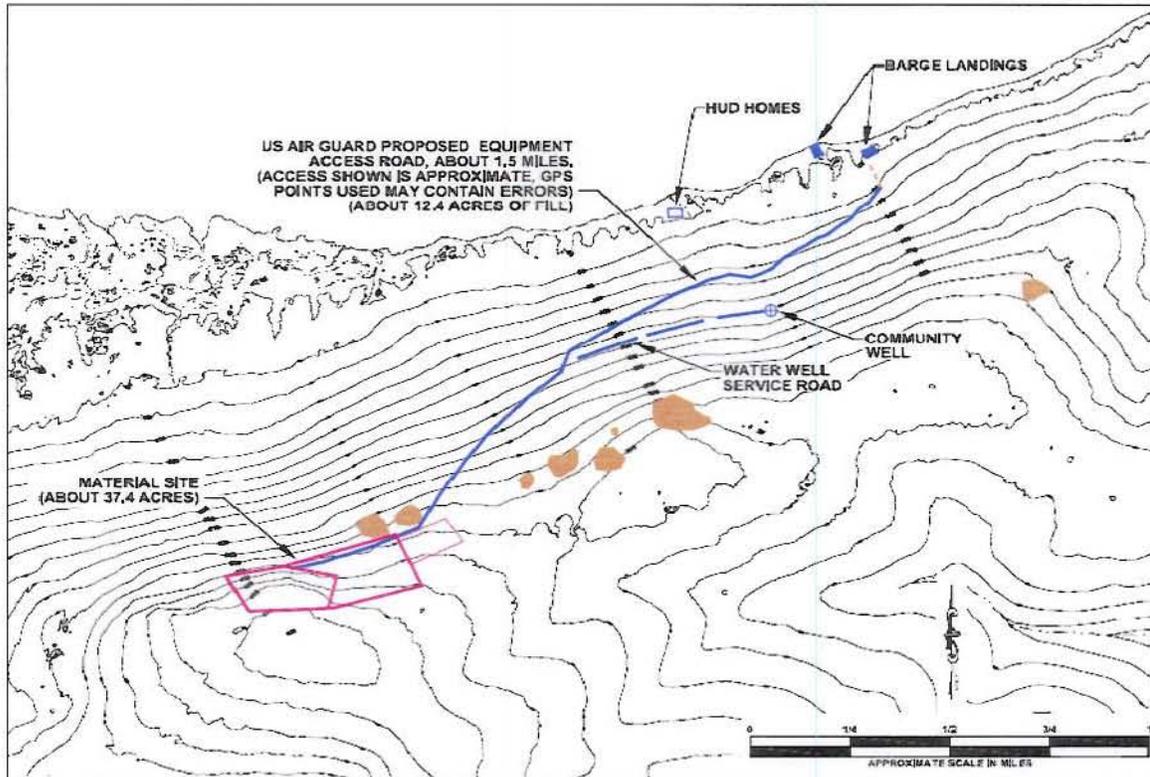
Proposed quarry location and road alignment. The water well road is speculative and is not proposed for permitting at this time. Tan blotches below (north of) the hill crest represent boulder patches, which are not project features.
